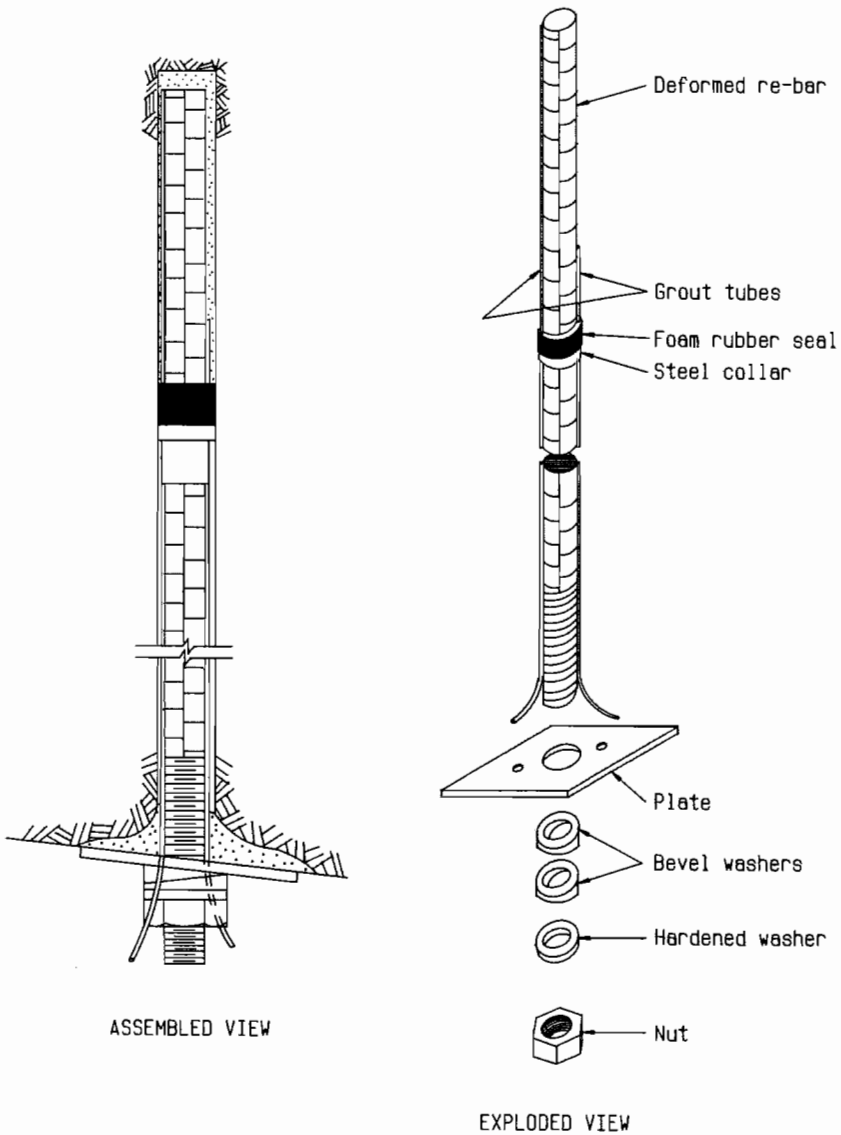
Grouted End Anchorage, Pumpable Type (U.S. Army, 1980).
